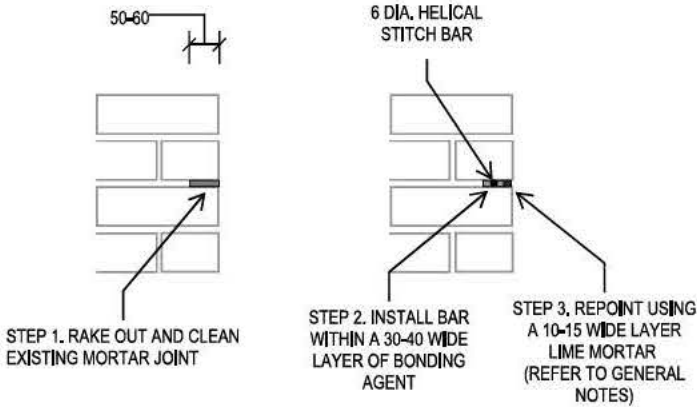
VERTICAL CRACKS >3 mm WIDE
